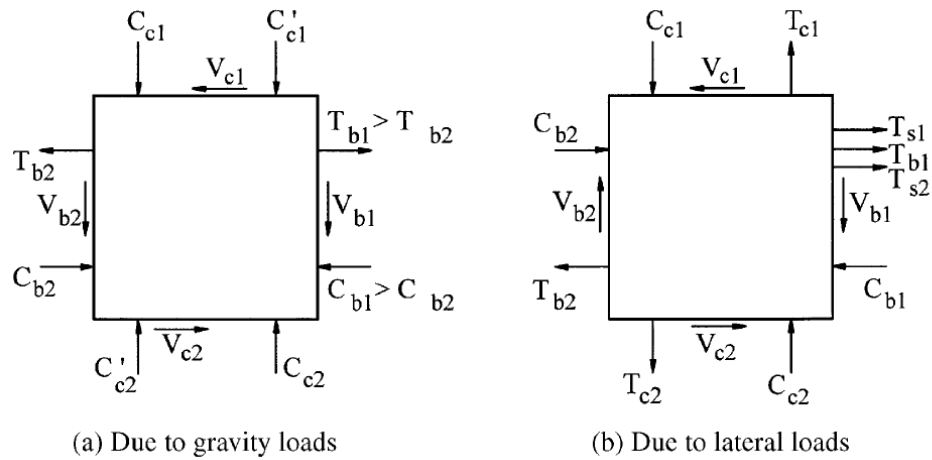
Joint Forces at Critical Sections (ACI 352R-02)
